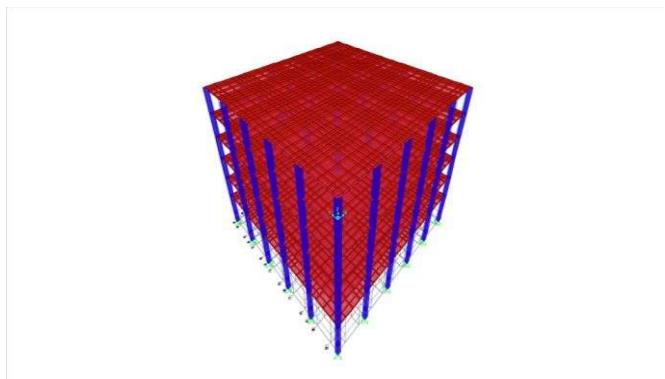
3D Model of flat slab building (SAP-2000 Window)
